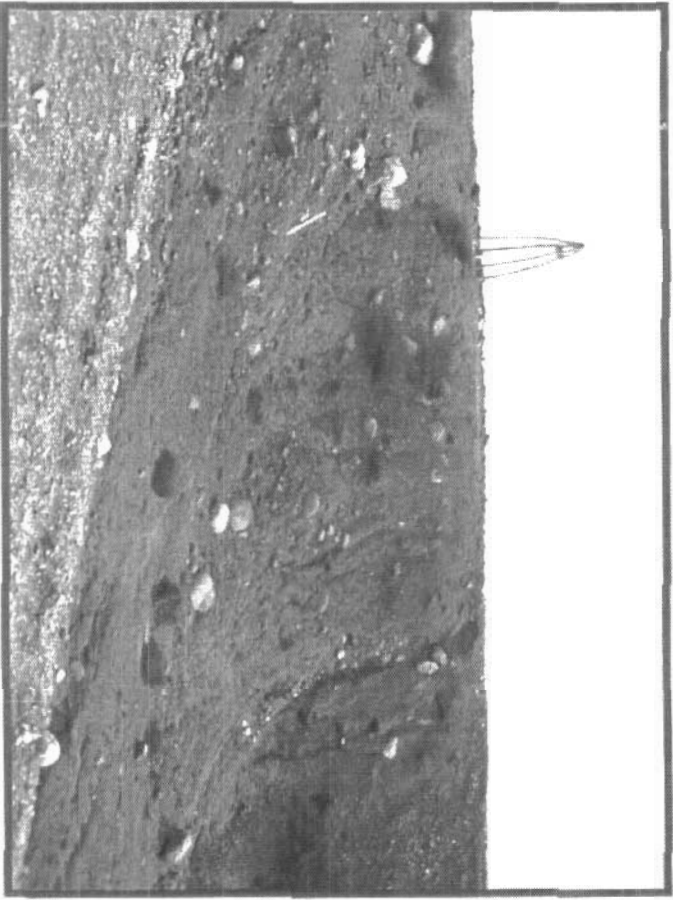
shows one significant erosional gully located on the downstream face at the north abutment.
